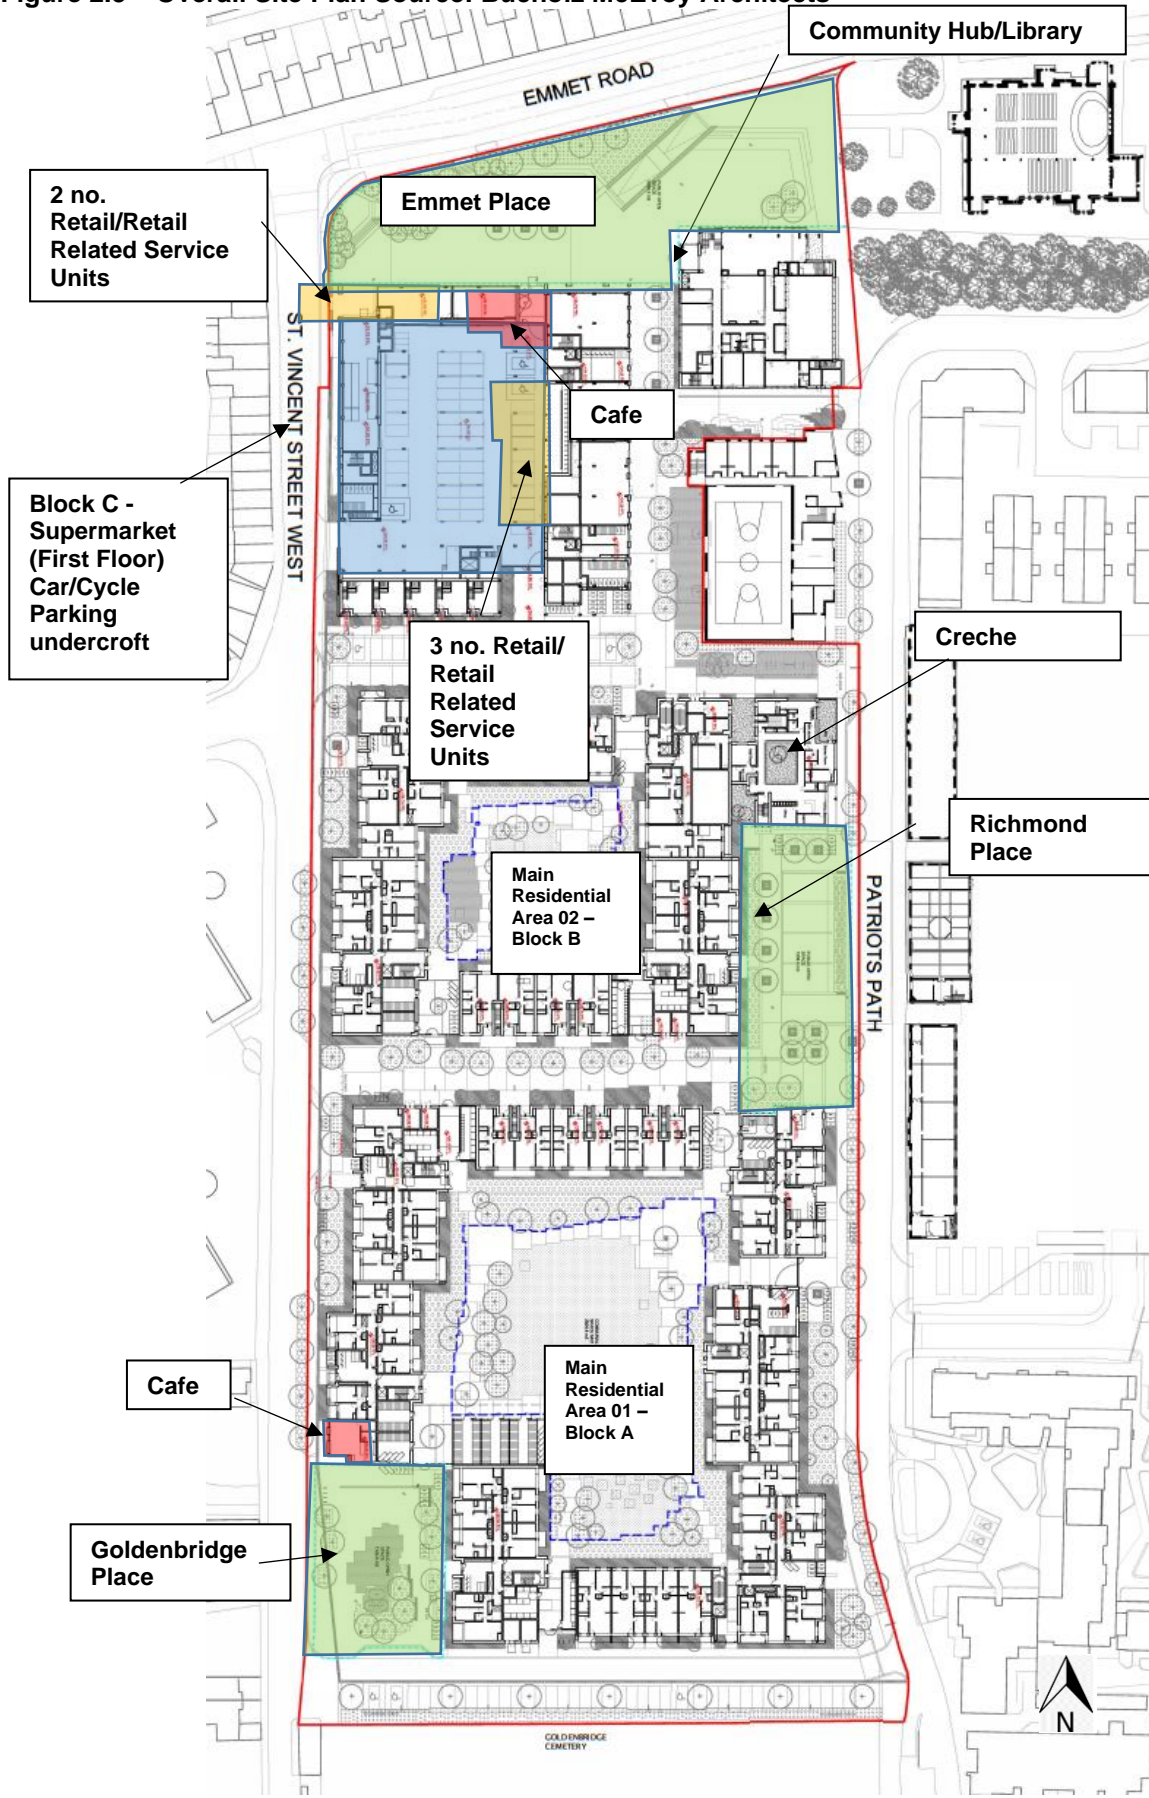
Overall Site Plan Source: Bucholz McEvoy Architects
